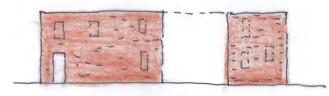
Nimrod Street. Existing brickwork facade. Source: TZG Architects, 2022.
